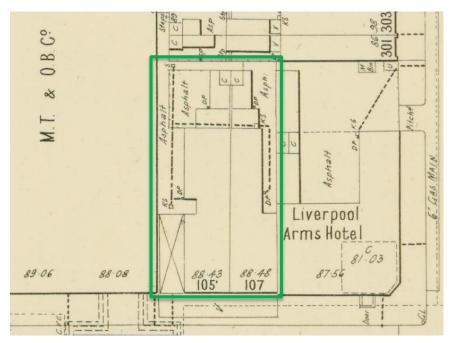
105-107 Johnston Street shown on the 1900 MMBW Detail Plan (No. 1241, dated 1900).
